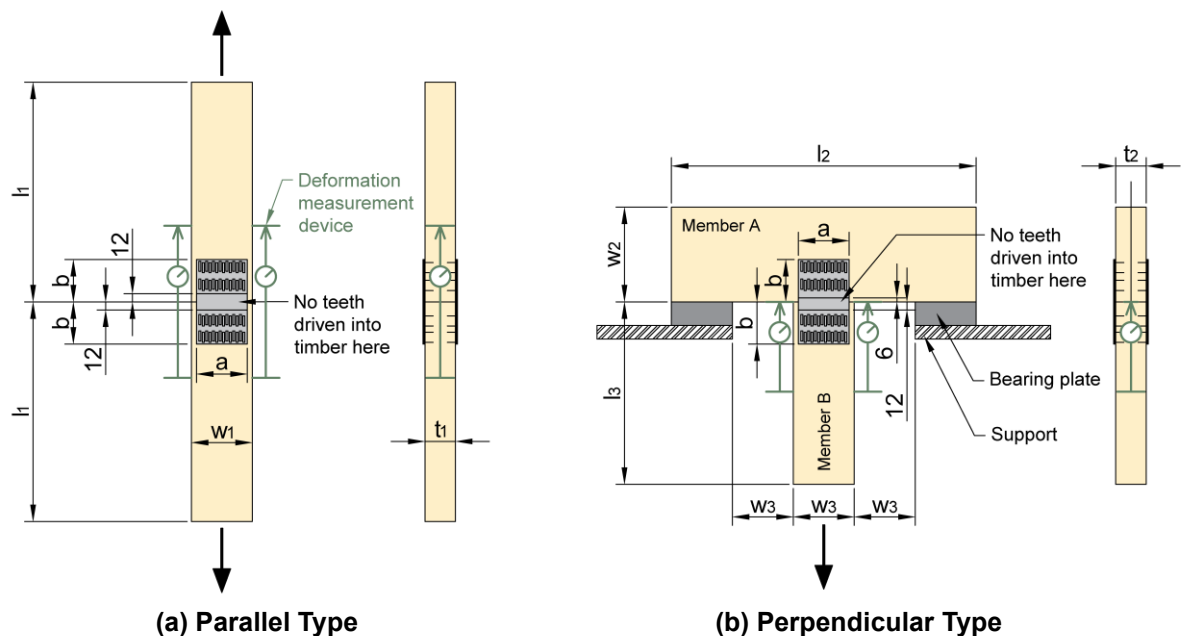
Test specimen configuration for the shear resistance of the metal connector plate teeth of Category C fasteners
